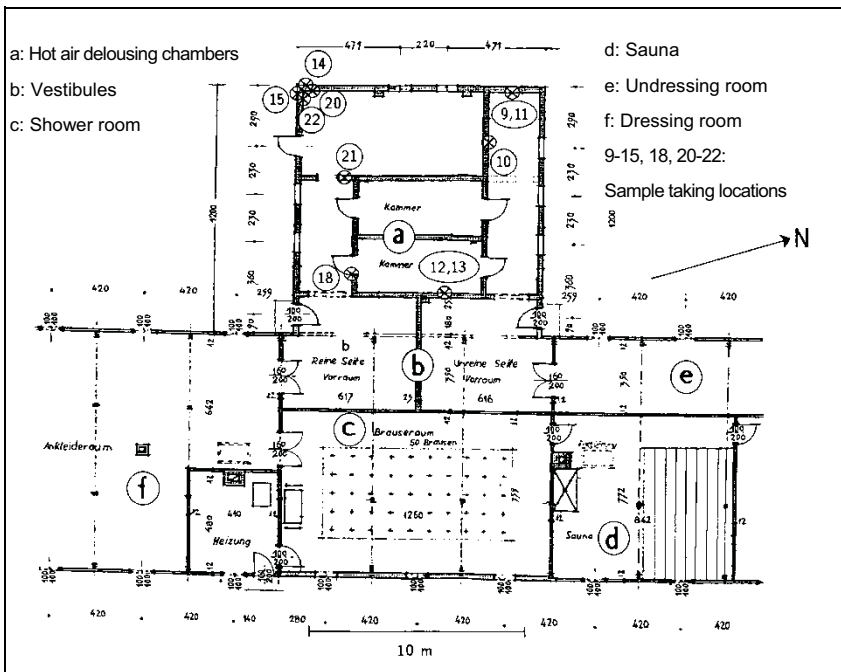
Ground plan of the hot air disinfestation wing of building 5a after building alterations in 1943. BW 5a sample taking locations drawn in.¹⁵⁸
